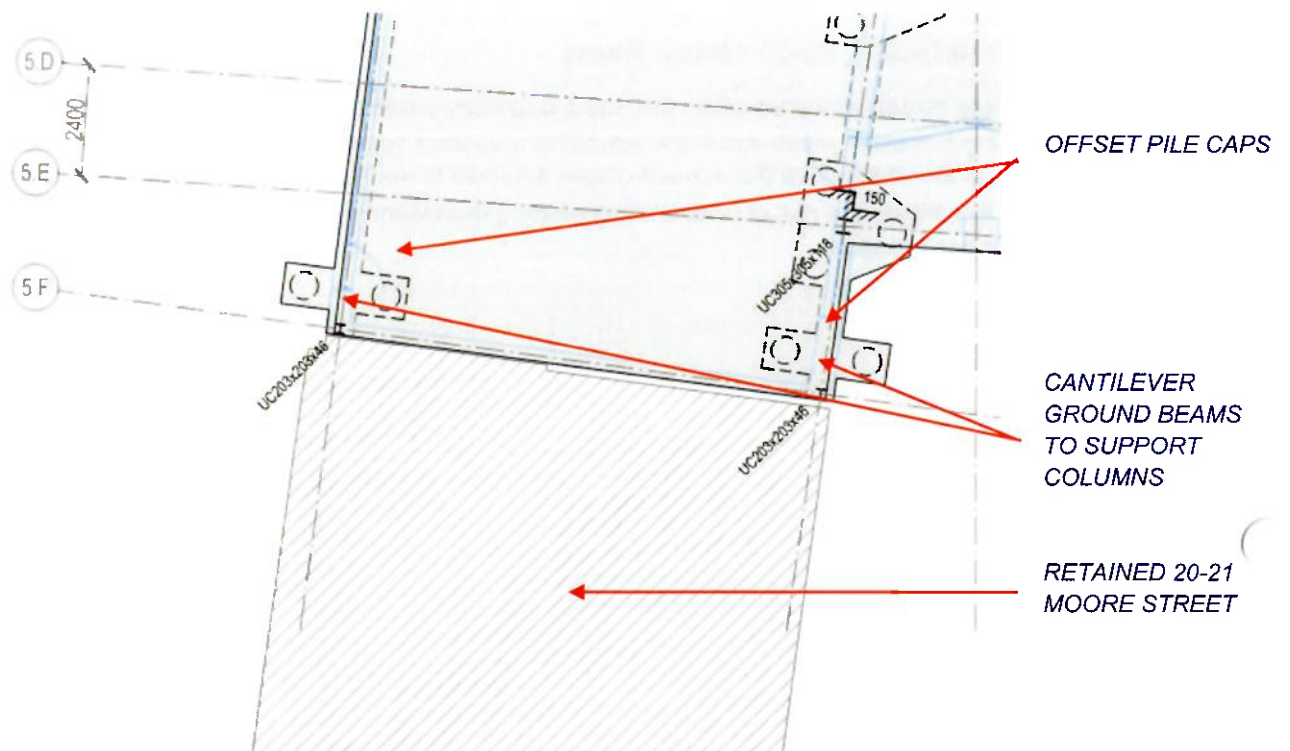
Proposed Foundation Arrangement Adjacent to Existing Building
